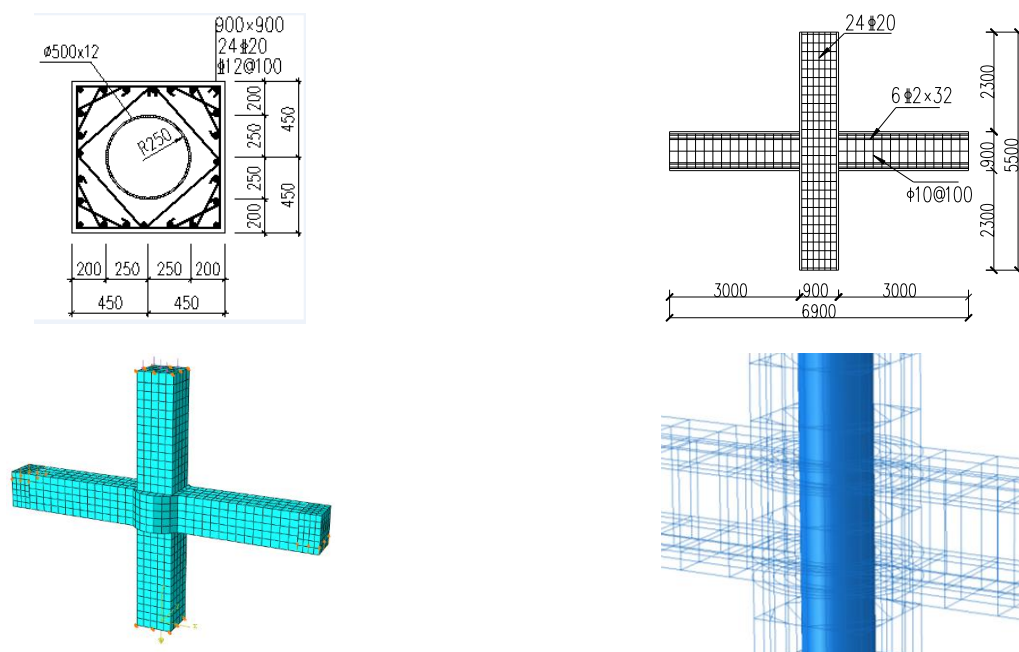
Numerical model and dimensions of steel tube-reinforced concrete column structure joints
